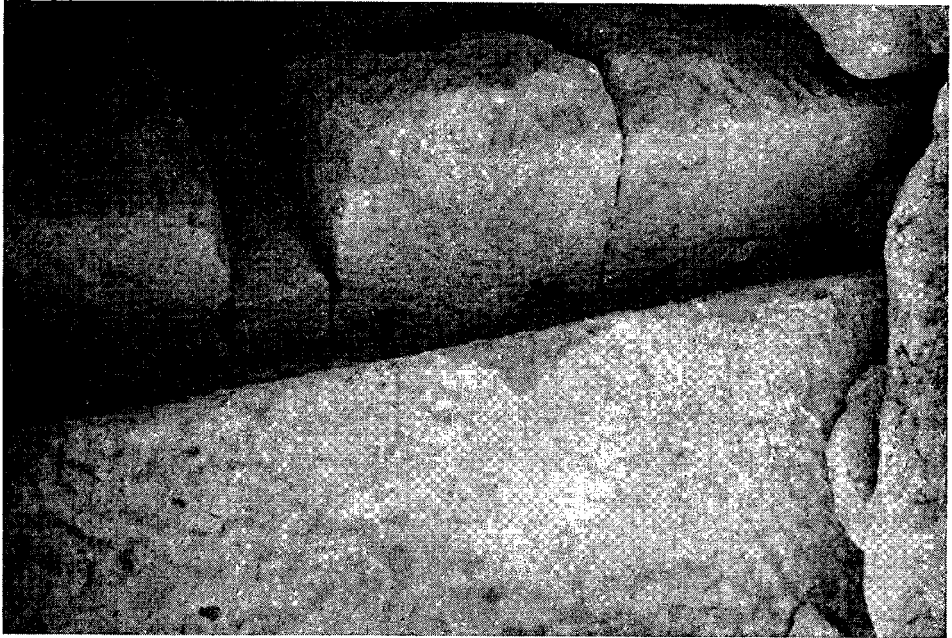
South side of tomb chamber. Clamps tying central gable block to lateral wall blocks.
